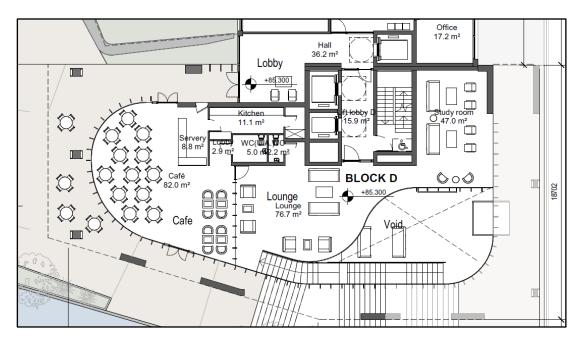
Extract from Proposed Landscape Plan Illustrating the Location of the Proposed Café.
